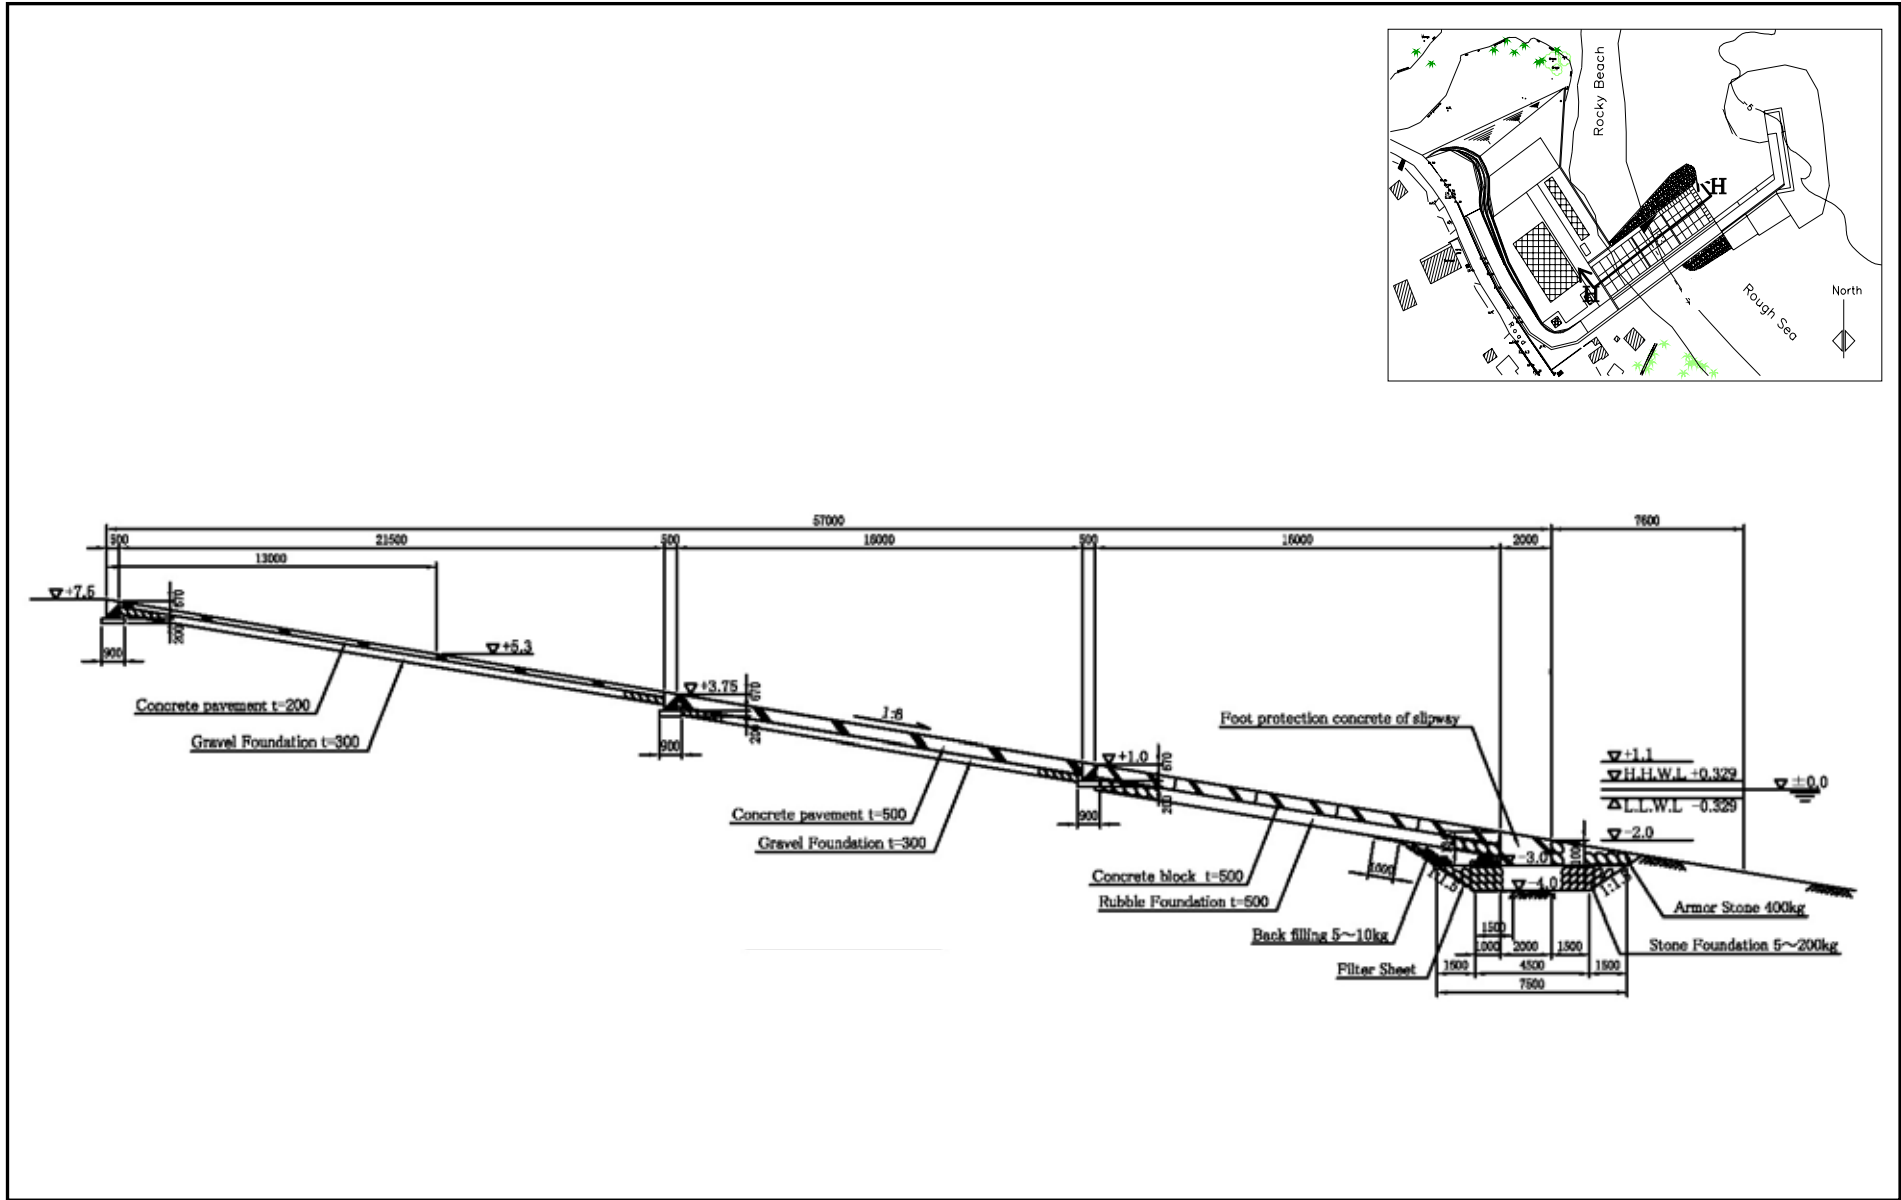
(9) Cross Section for Slipway (Section H-H)
